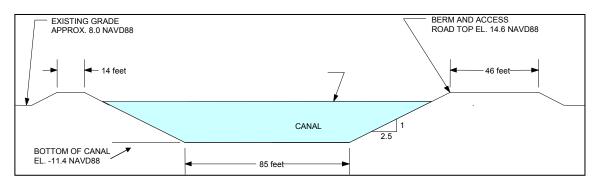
Typical Northeast Pump Station Connector Canal Cross-Section
